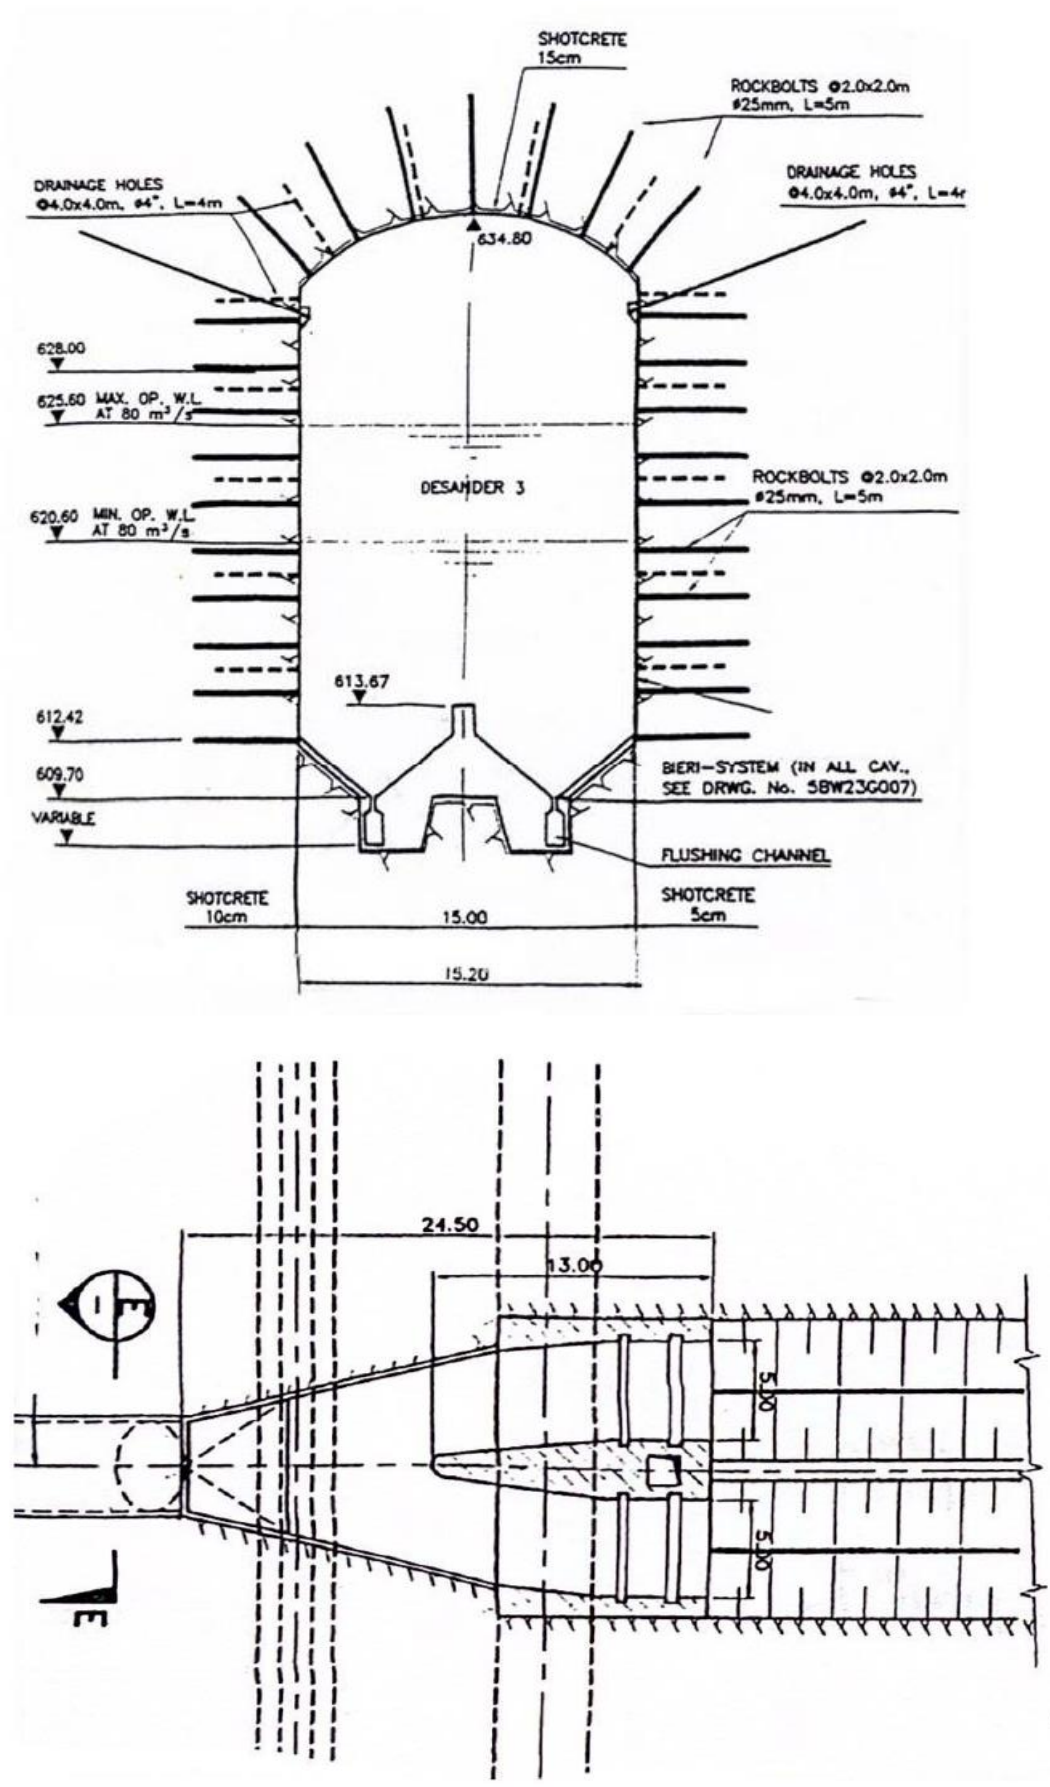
Engineering Drawing (Plan & Section View) of BVFS in MMHPP
